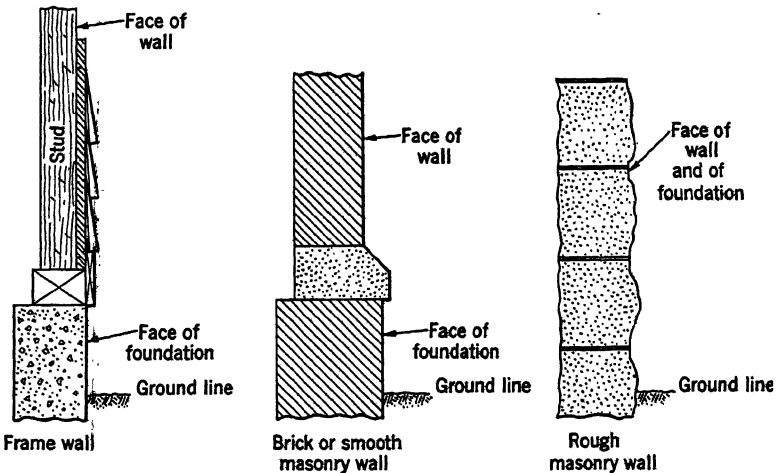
Typical walls. Measurements to buildings are made to face of wall or to face of foundation and so noted.
